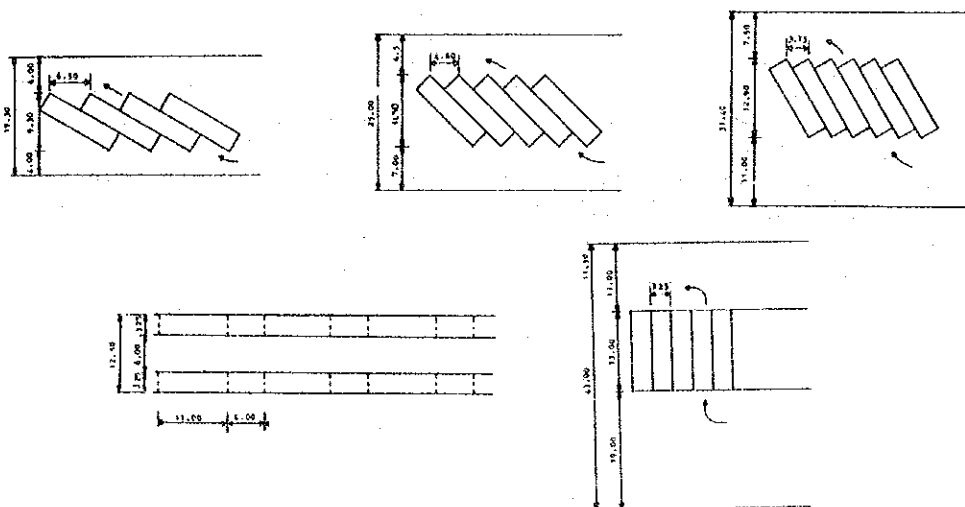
EXAMPLES OF PARKING LOT ARRANGEMENTS
